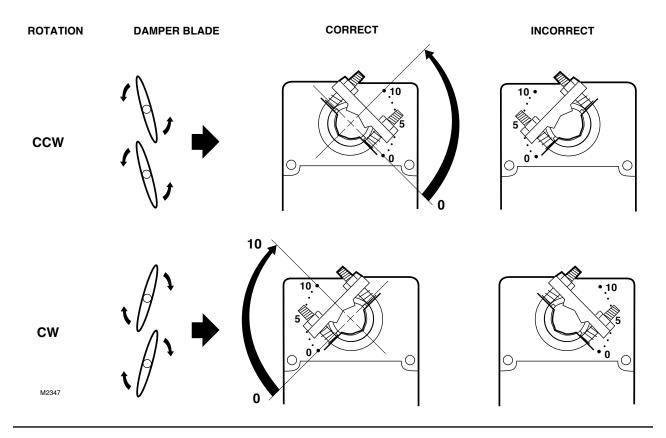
Actuator mounting direction and U-bolt clamp assembly attachment.
